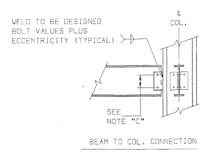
Typical beam-to-column connection detail on Sheet S-24 of the structural construction documents showing both shear tab and double angle connections (TISHMAN014741)
